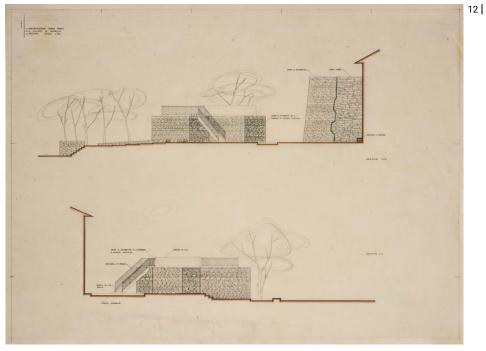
General plan for Vicchio del Mugello, west door restoration, plan, scale 1:50, B038564S, CSAC.
